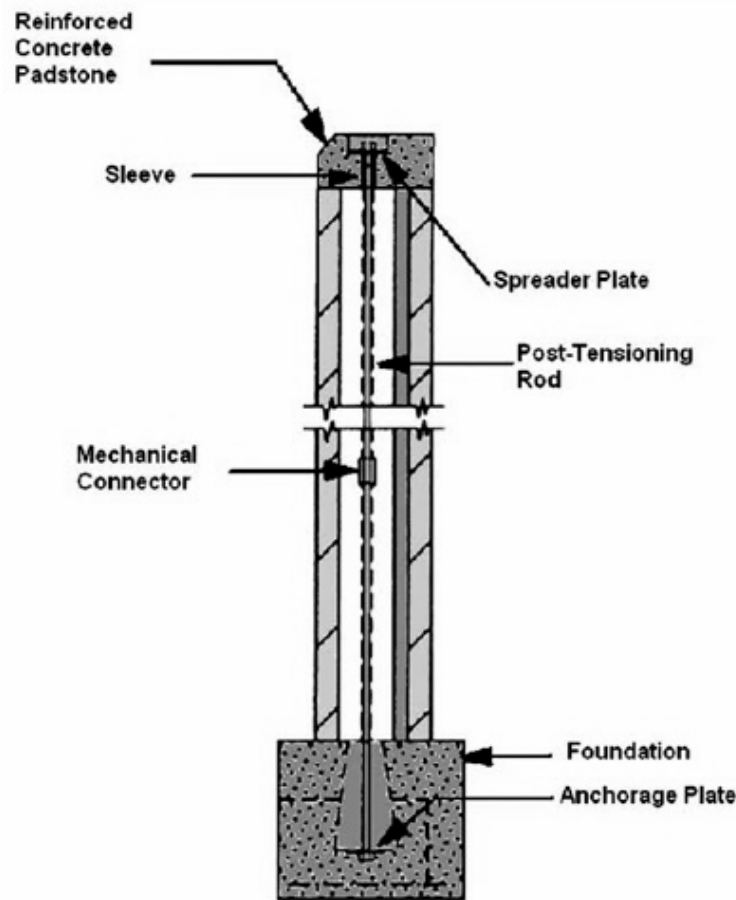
Post tensioning of masonry using steel tendons [58]
